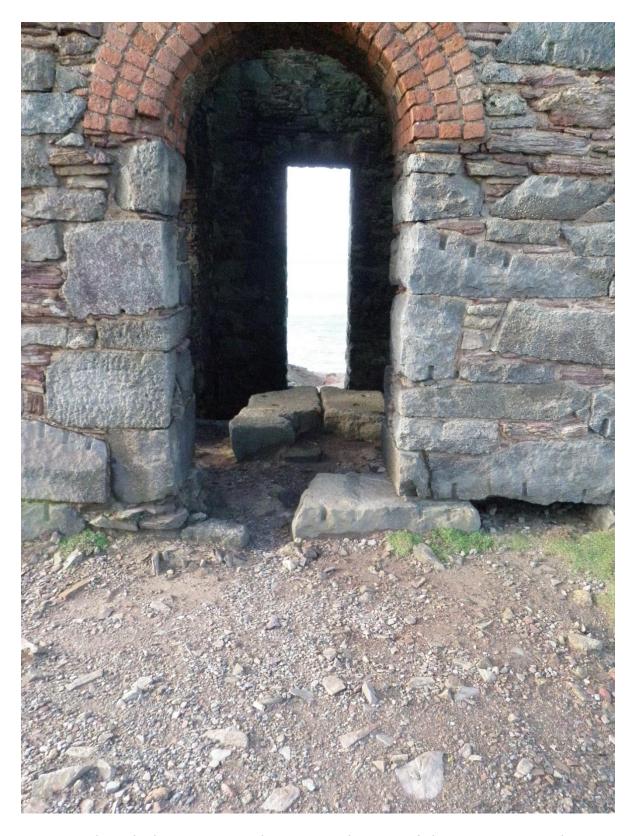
The cylinder opening in the eastern elevation of the stamps engine house, showing the low level flue connection to the boiler house which formerly abutted this side of the building.
